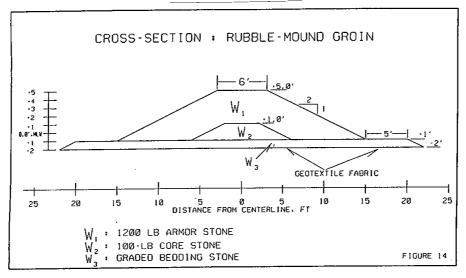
Cross-Section of Proposed Rubble-Mound Groin.
